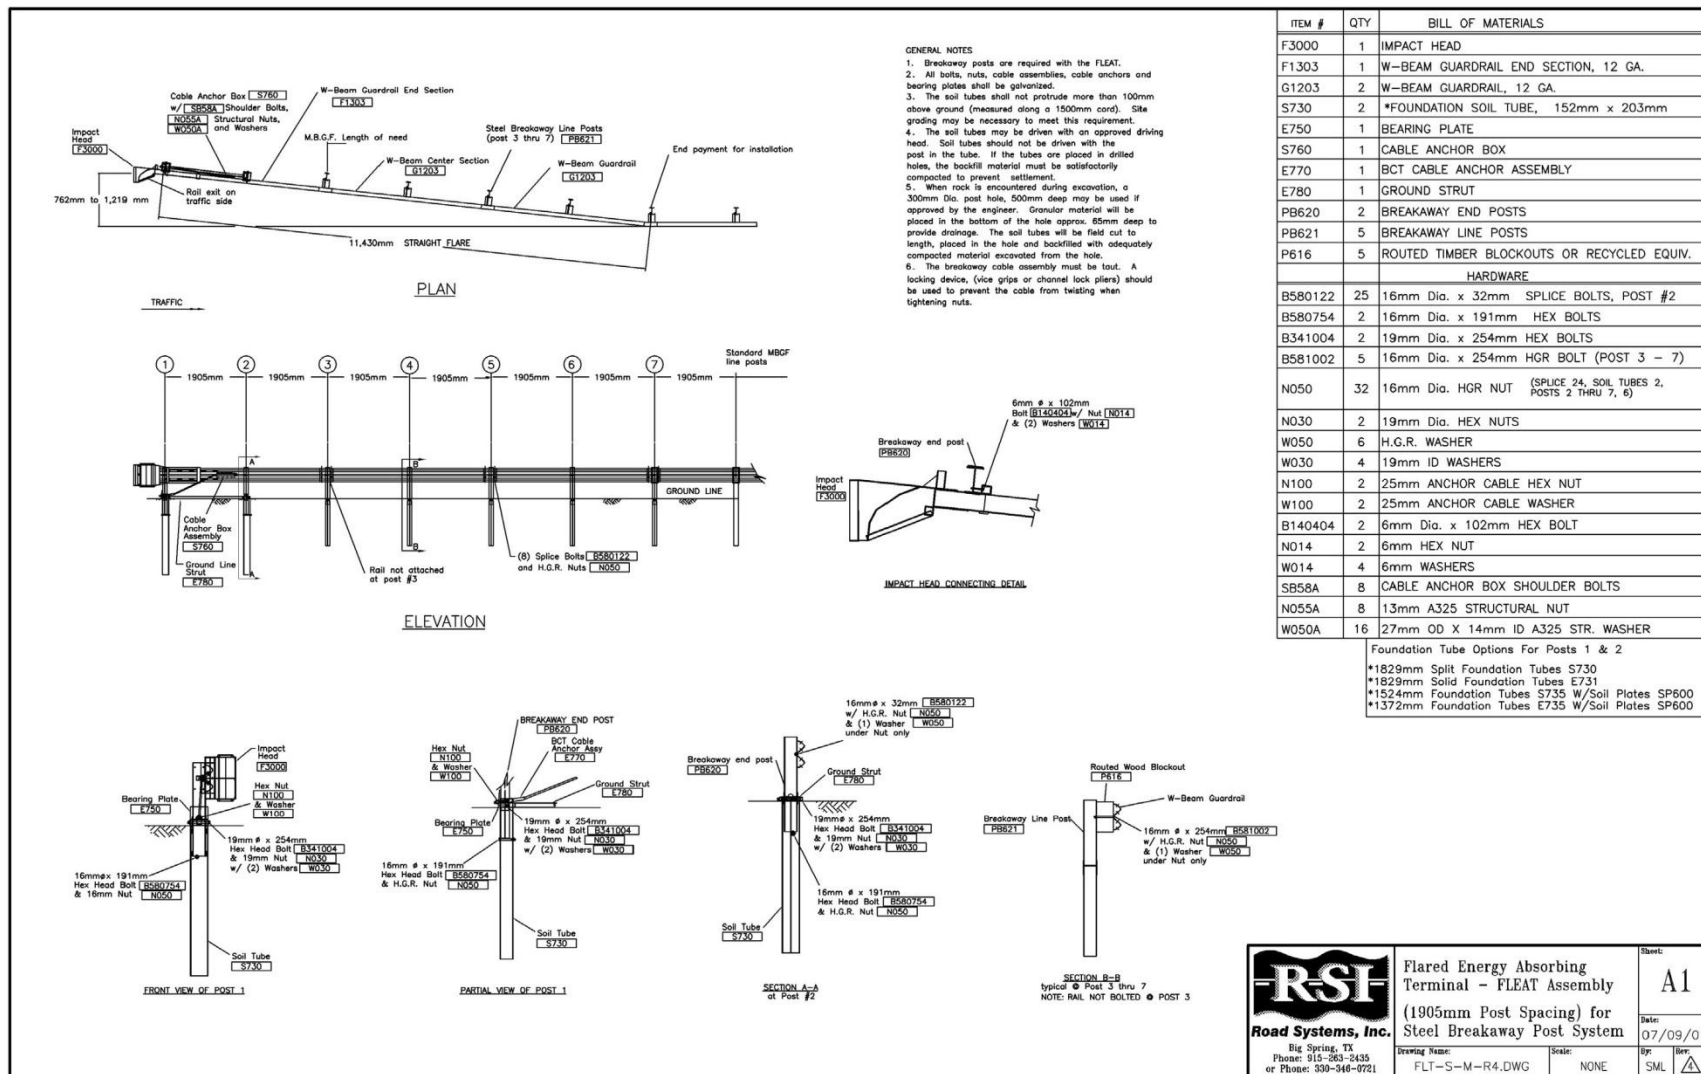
Cable Transition to FLEAT End Terminal Details, Test FCT-1, 2003 [59]
